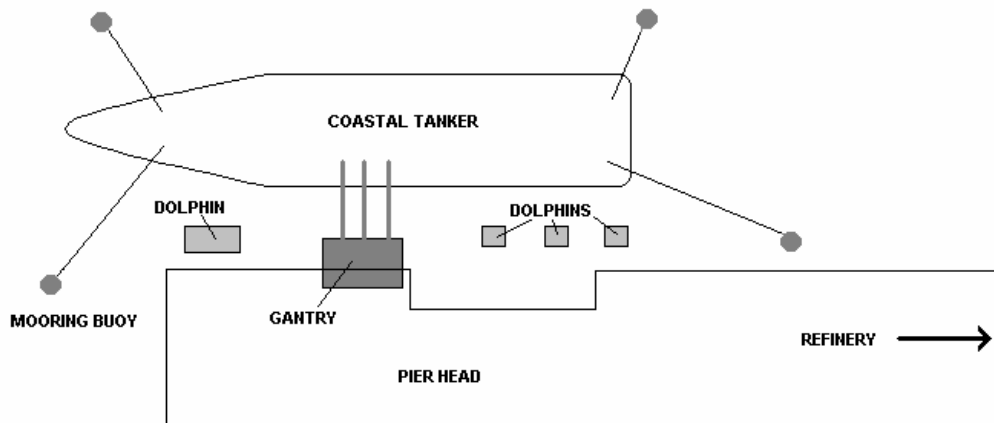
Schematization of a coastal tanker mooring at the pier (plan view)
